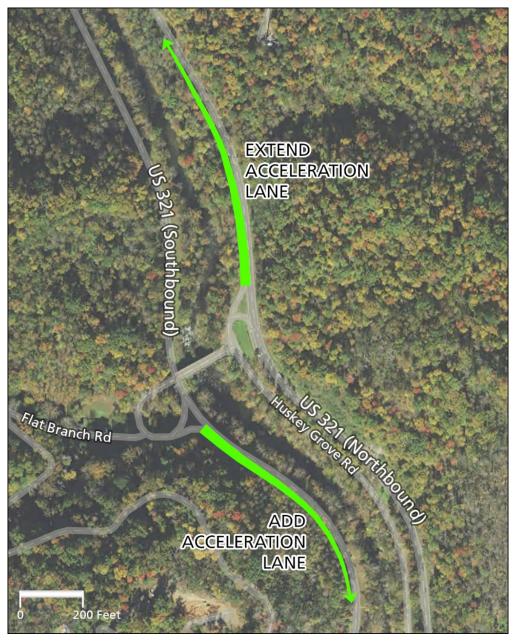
ALTERNATIVE 2—SUBAREA 2 PROPOSED ACCELERATION LANES
